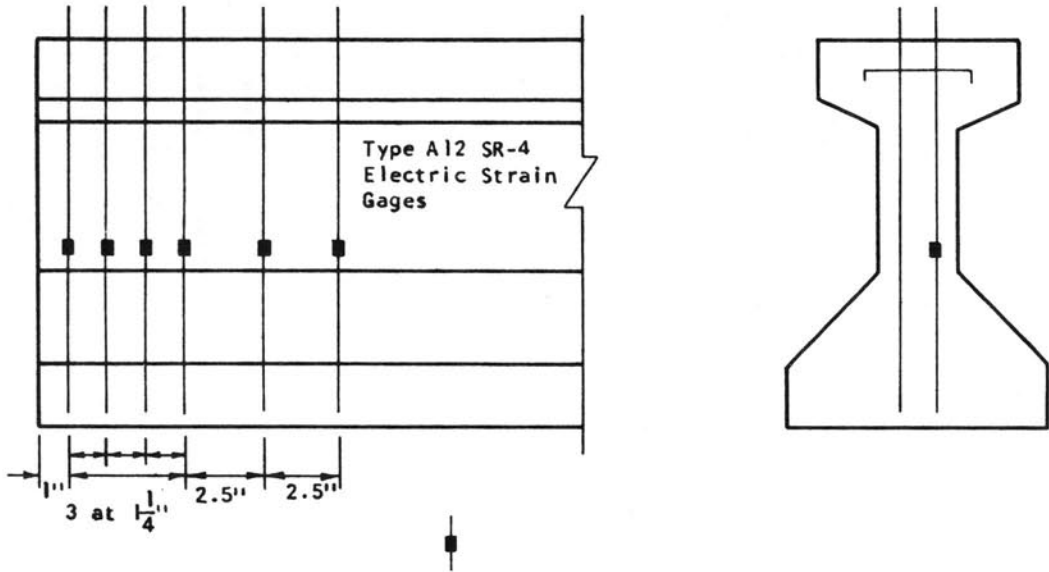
SPACING OF VERTICAL STIRRUPS IN ENDS OF SERIES B GIRDERS
